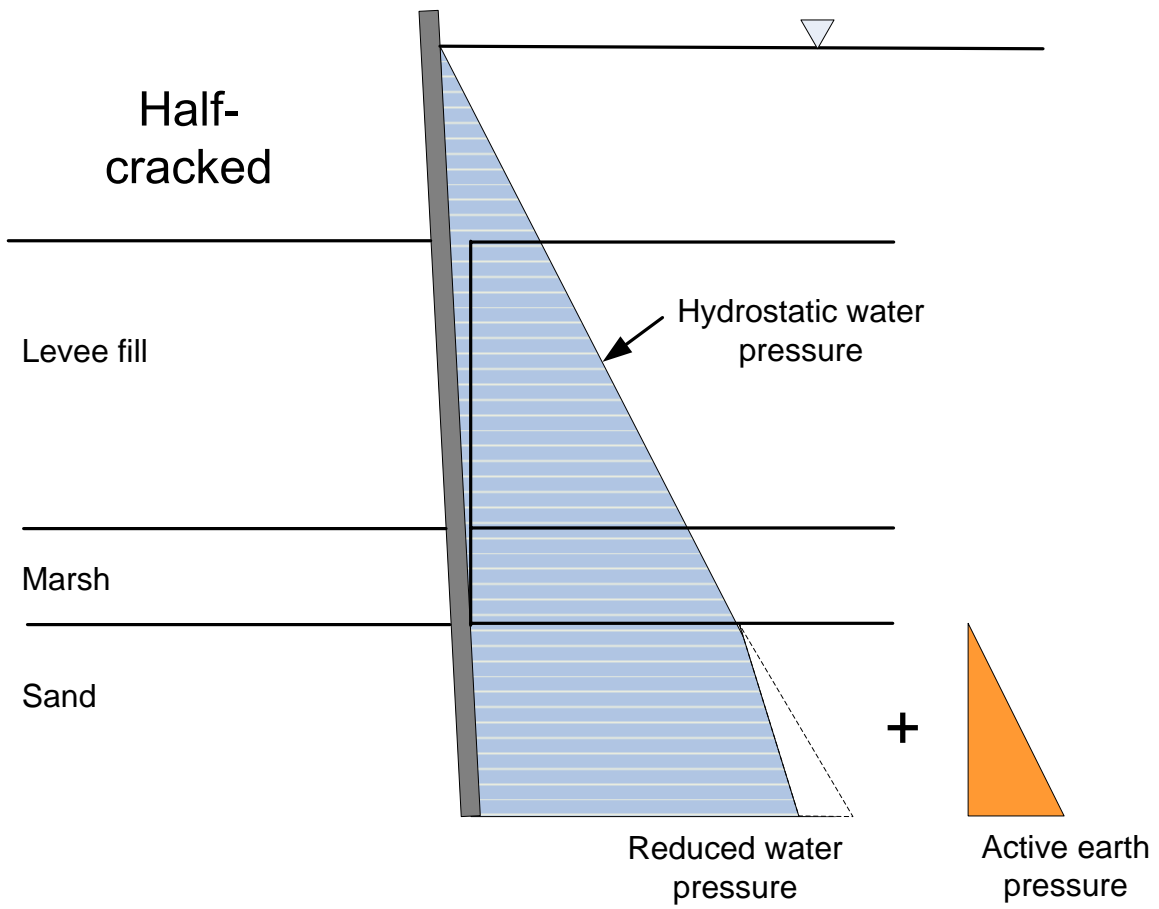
Schematic of crack used in London Avenue Canal stability analyses.
